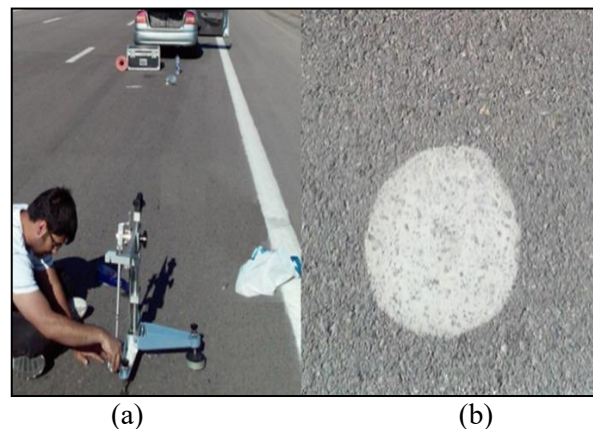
Conducting a) British Pendulum testing in the wheel path b) Sand Patch testing on the surface.
